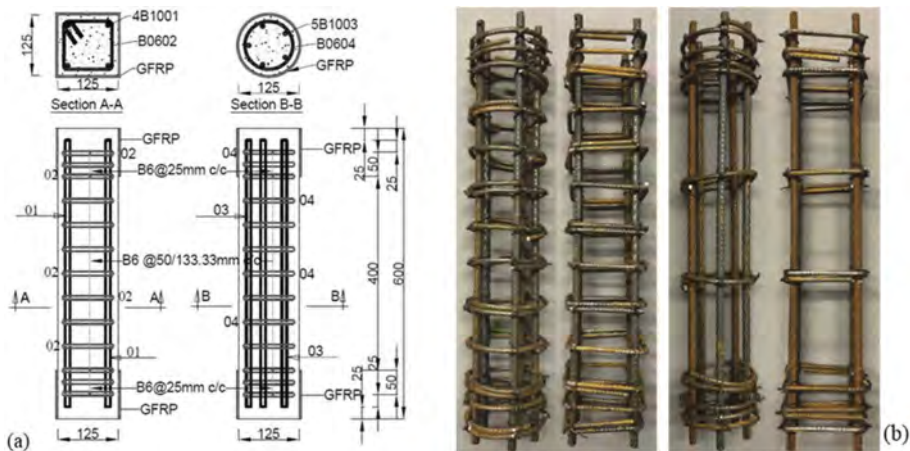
Specimen details; (a) schematic drawing and (b) Reinforcement layouts (cages) of the high and low confinement (circular and square columns).
